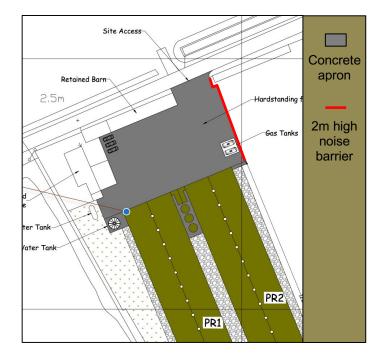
Plan showing advised 2m high noise barrier along the north-east boundary of the concrete apron
